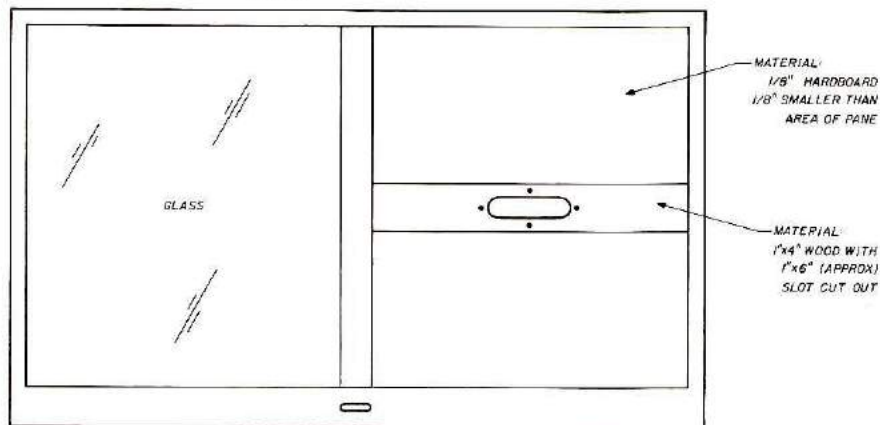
A removed, or broken, pane of glass can be replaced with hardboard panels and a strip of wood to provide safe entry of feeders, rotator-control cables, and the like.
